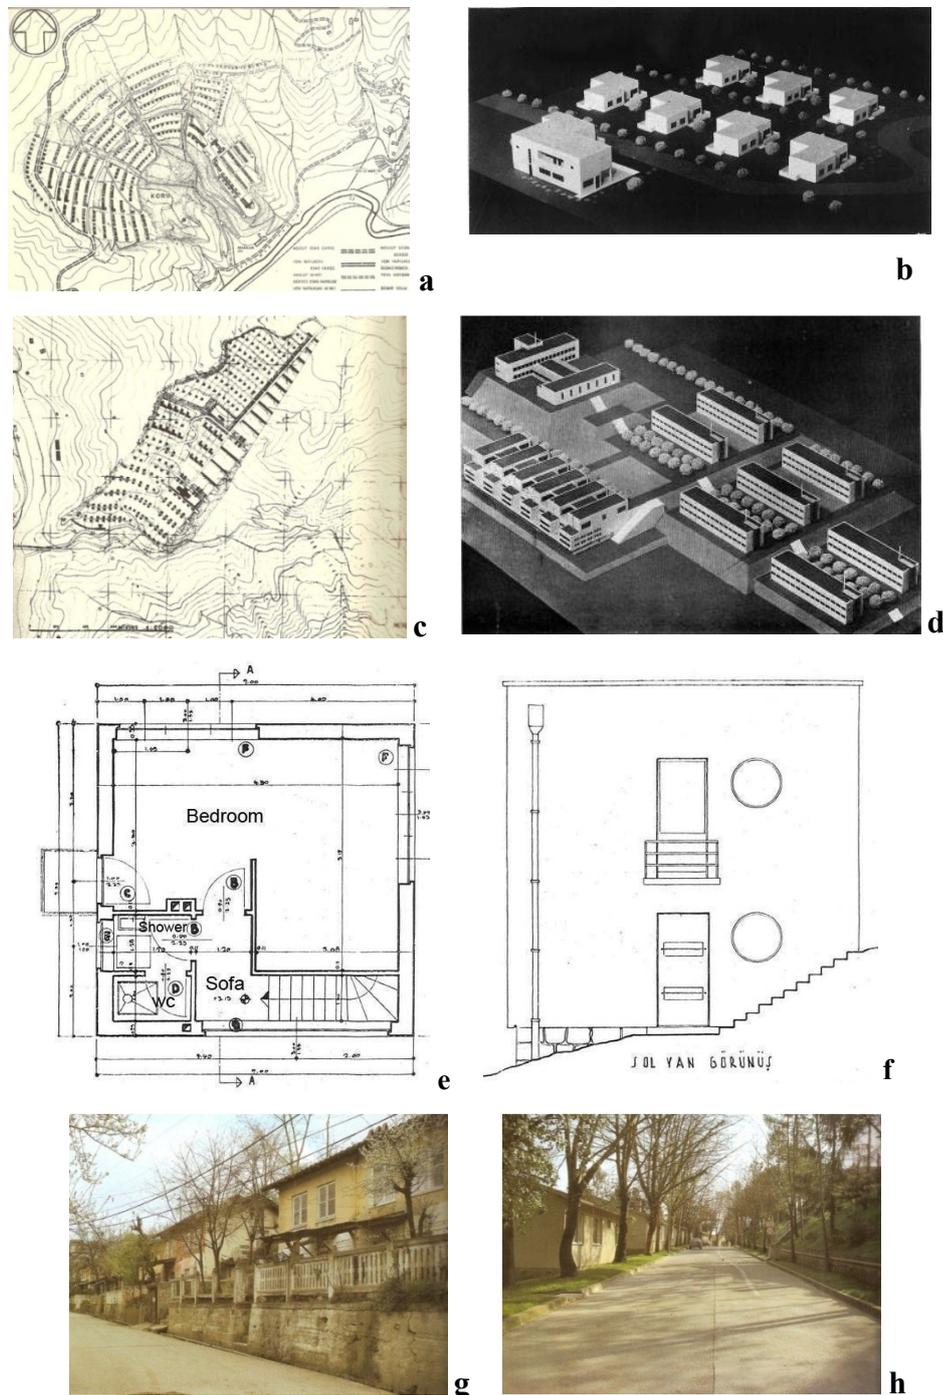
Kozlu Coal Workers' Neighborhood designed by Seyfi Arkan, Zonguldak, 1935-1936: a. Site plan; b. Model view demonstrating the detached houses; c. Detail from the site plan; d. Model view demonstrating the blocks; e. A typical plan for the units in factory lodgings; f. Elevation from the left side of a unit in factory lodgings; g. View from the civil servant lodgings; h. View from the factory lodgings (Sources: a., d., e., f. Arkan 1935, 253, 257, 254; b., c. Arkan 1936, 10, 9; g., h. Sey 1999, 302)
